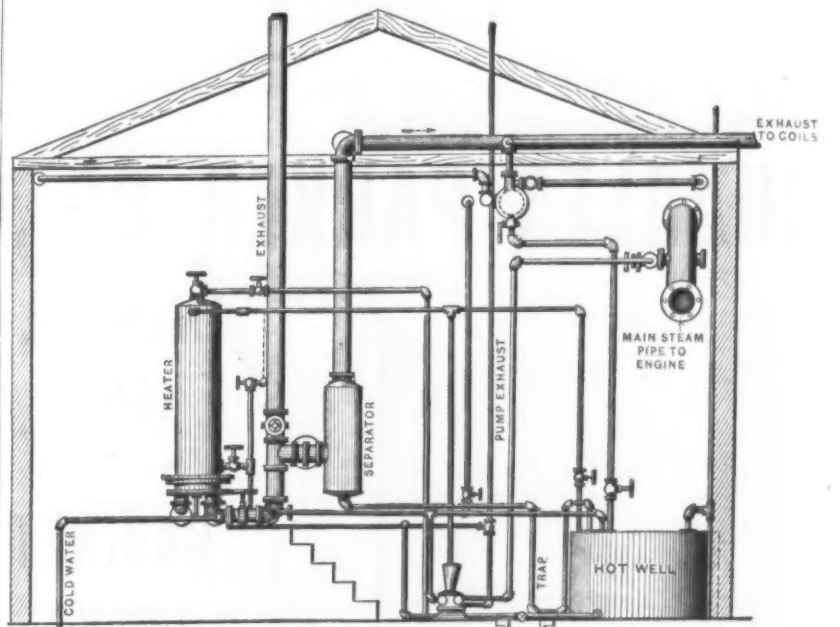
Section of Engine-Room, with Elevation of Piping in Hot Well.
